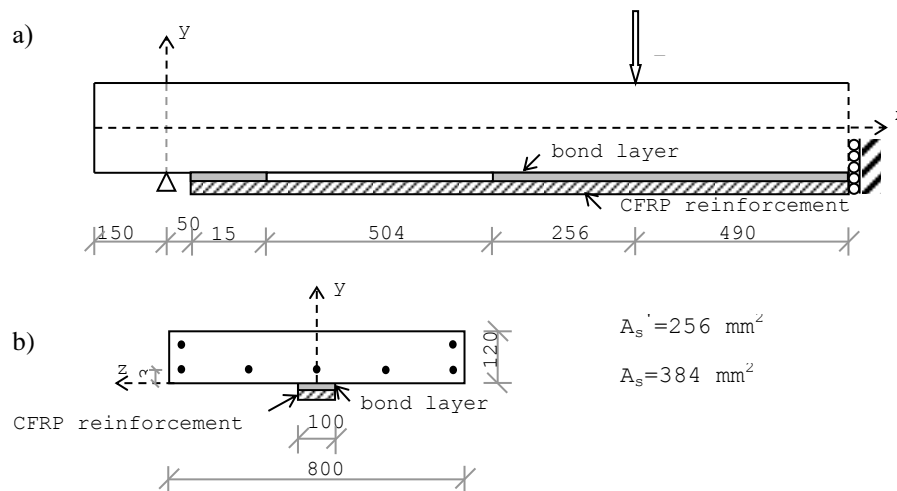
Beam element strengthened with CFRP strip: a) geometry of half beam; b) cross section of the strengthened beam.
